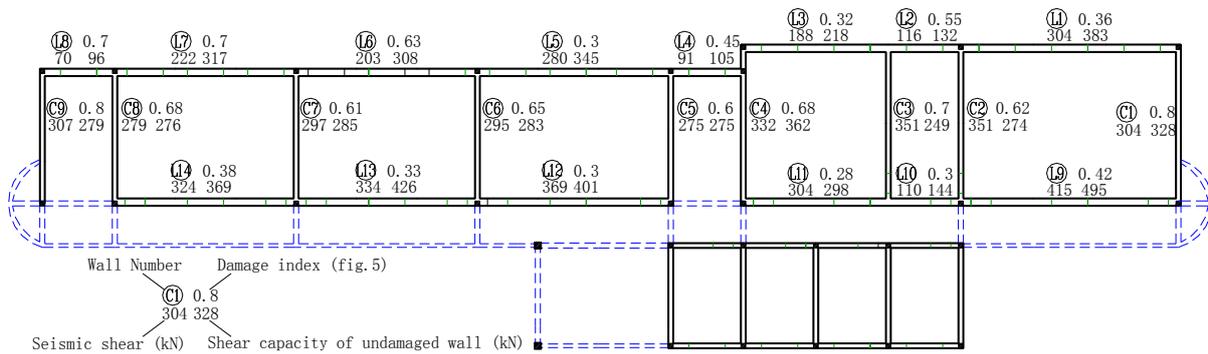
Damage indexes, Seismic shears and shear capacities of the walls in storey 1
